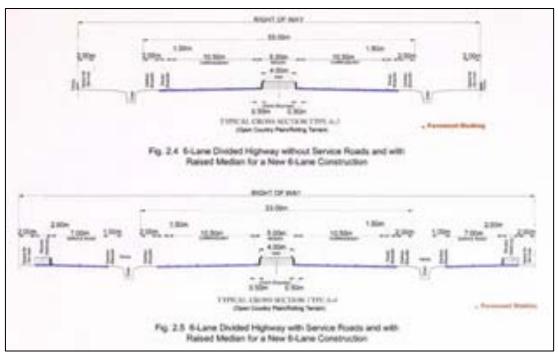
Typical Cross-section of 6 lane road with Raised Median
